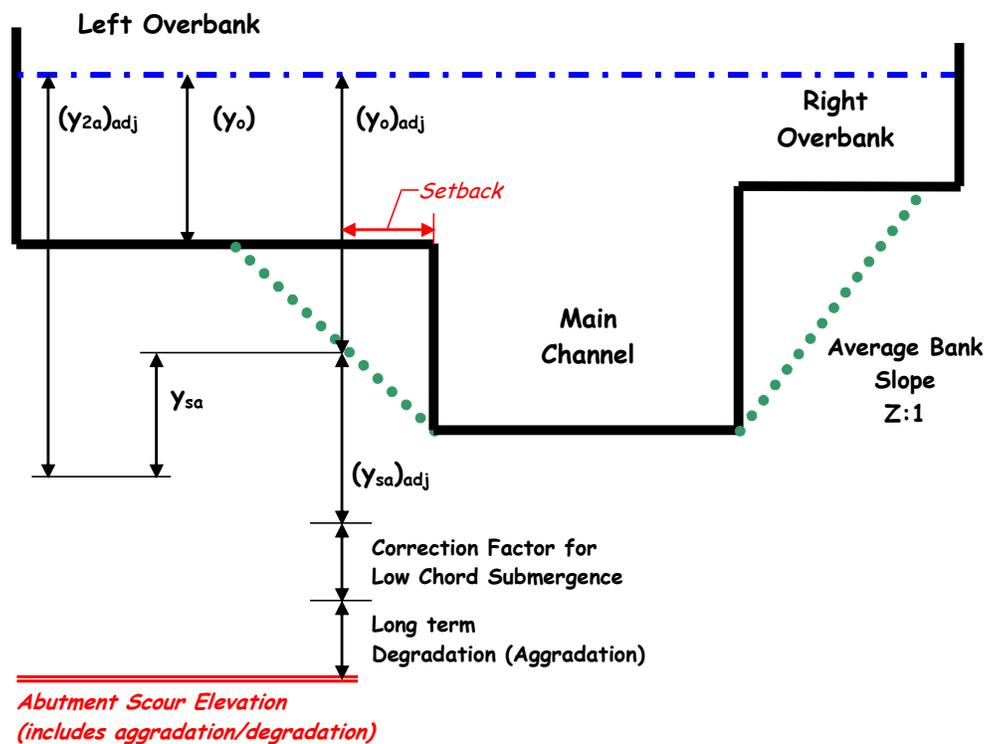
Definition Sketch for Abutment Scour Computations at Section 2, Bridge Section (Looking Downstream)
